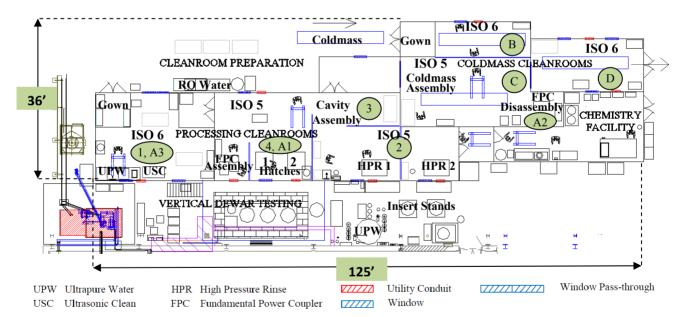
Proposed cleanroom layout for cavity processing and coldmass assembly.
